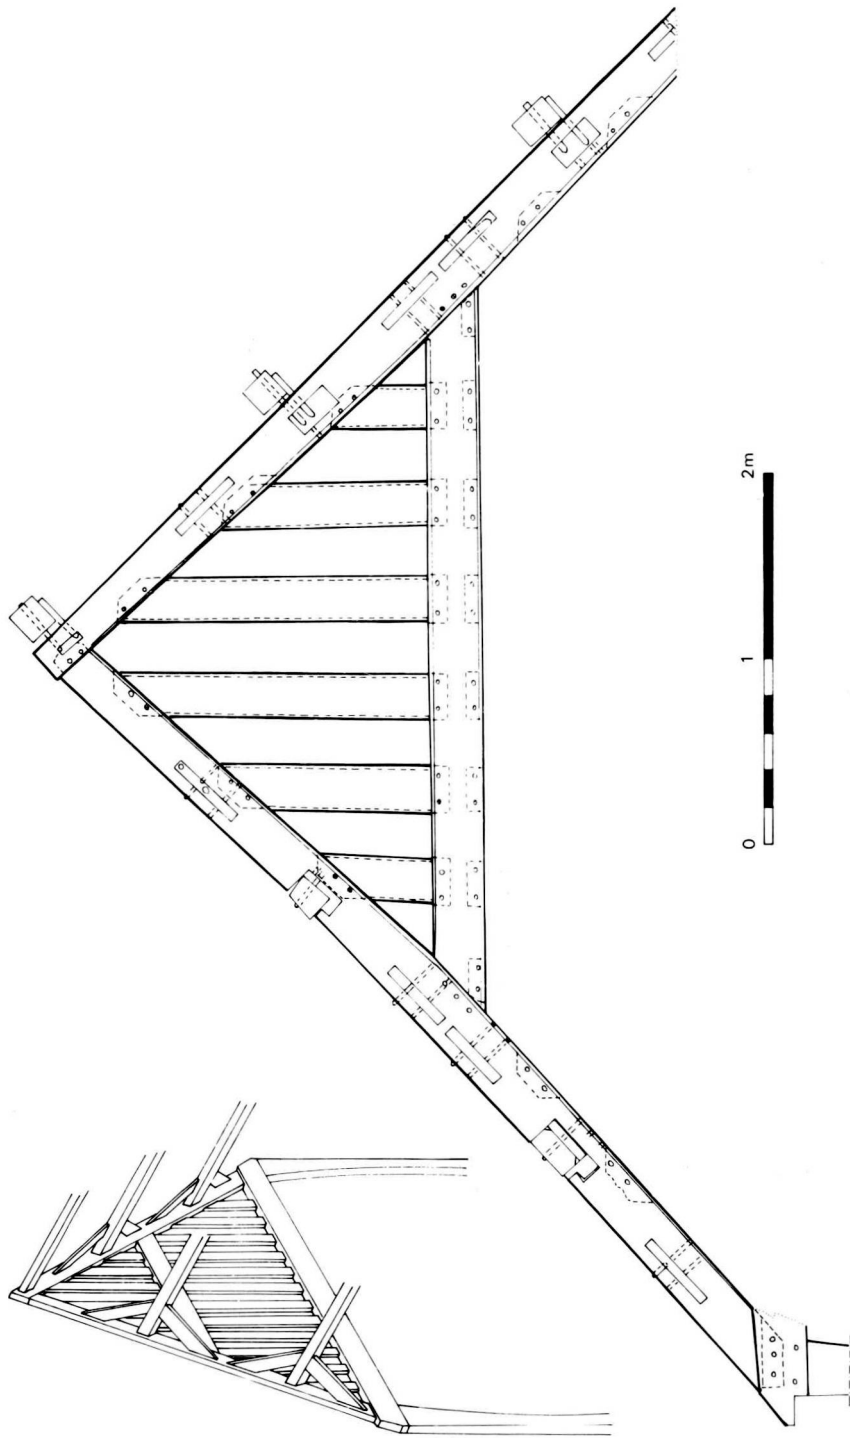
Elevation of southernmost truss in the west range with isometric reconstruction.
